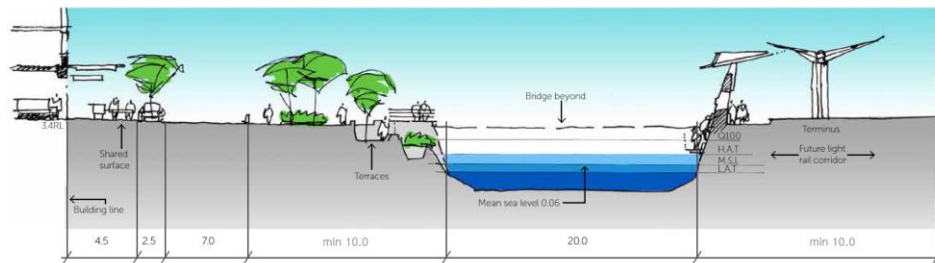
Corso Esplanade (West of Main Street Boulevard) (Looking West)
